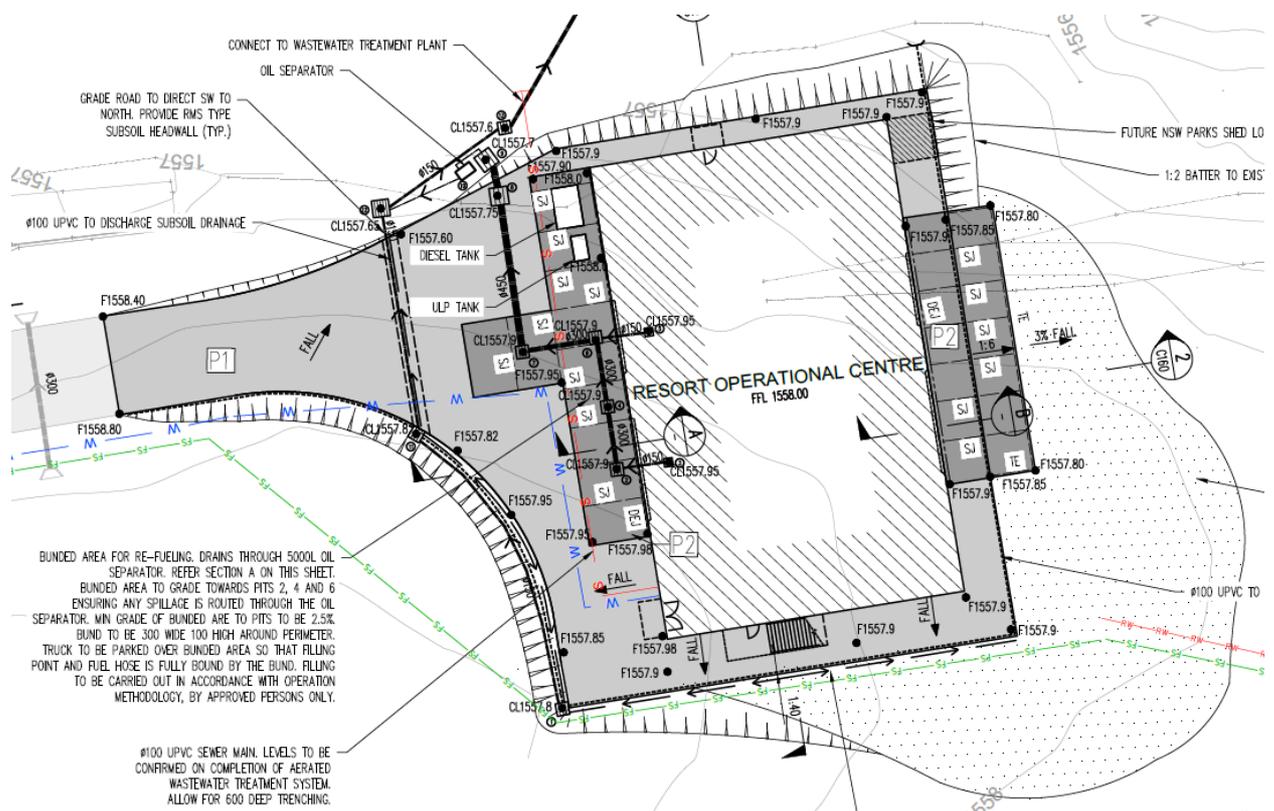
| Resort operations centre site plan (Source: Applicant's documentation)
